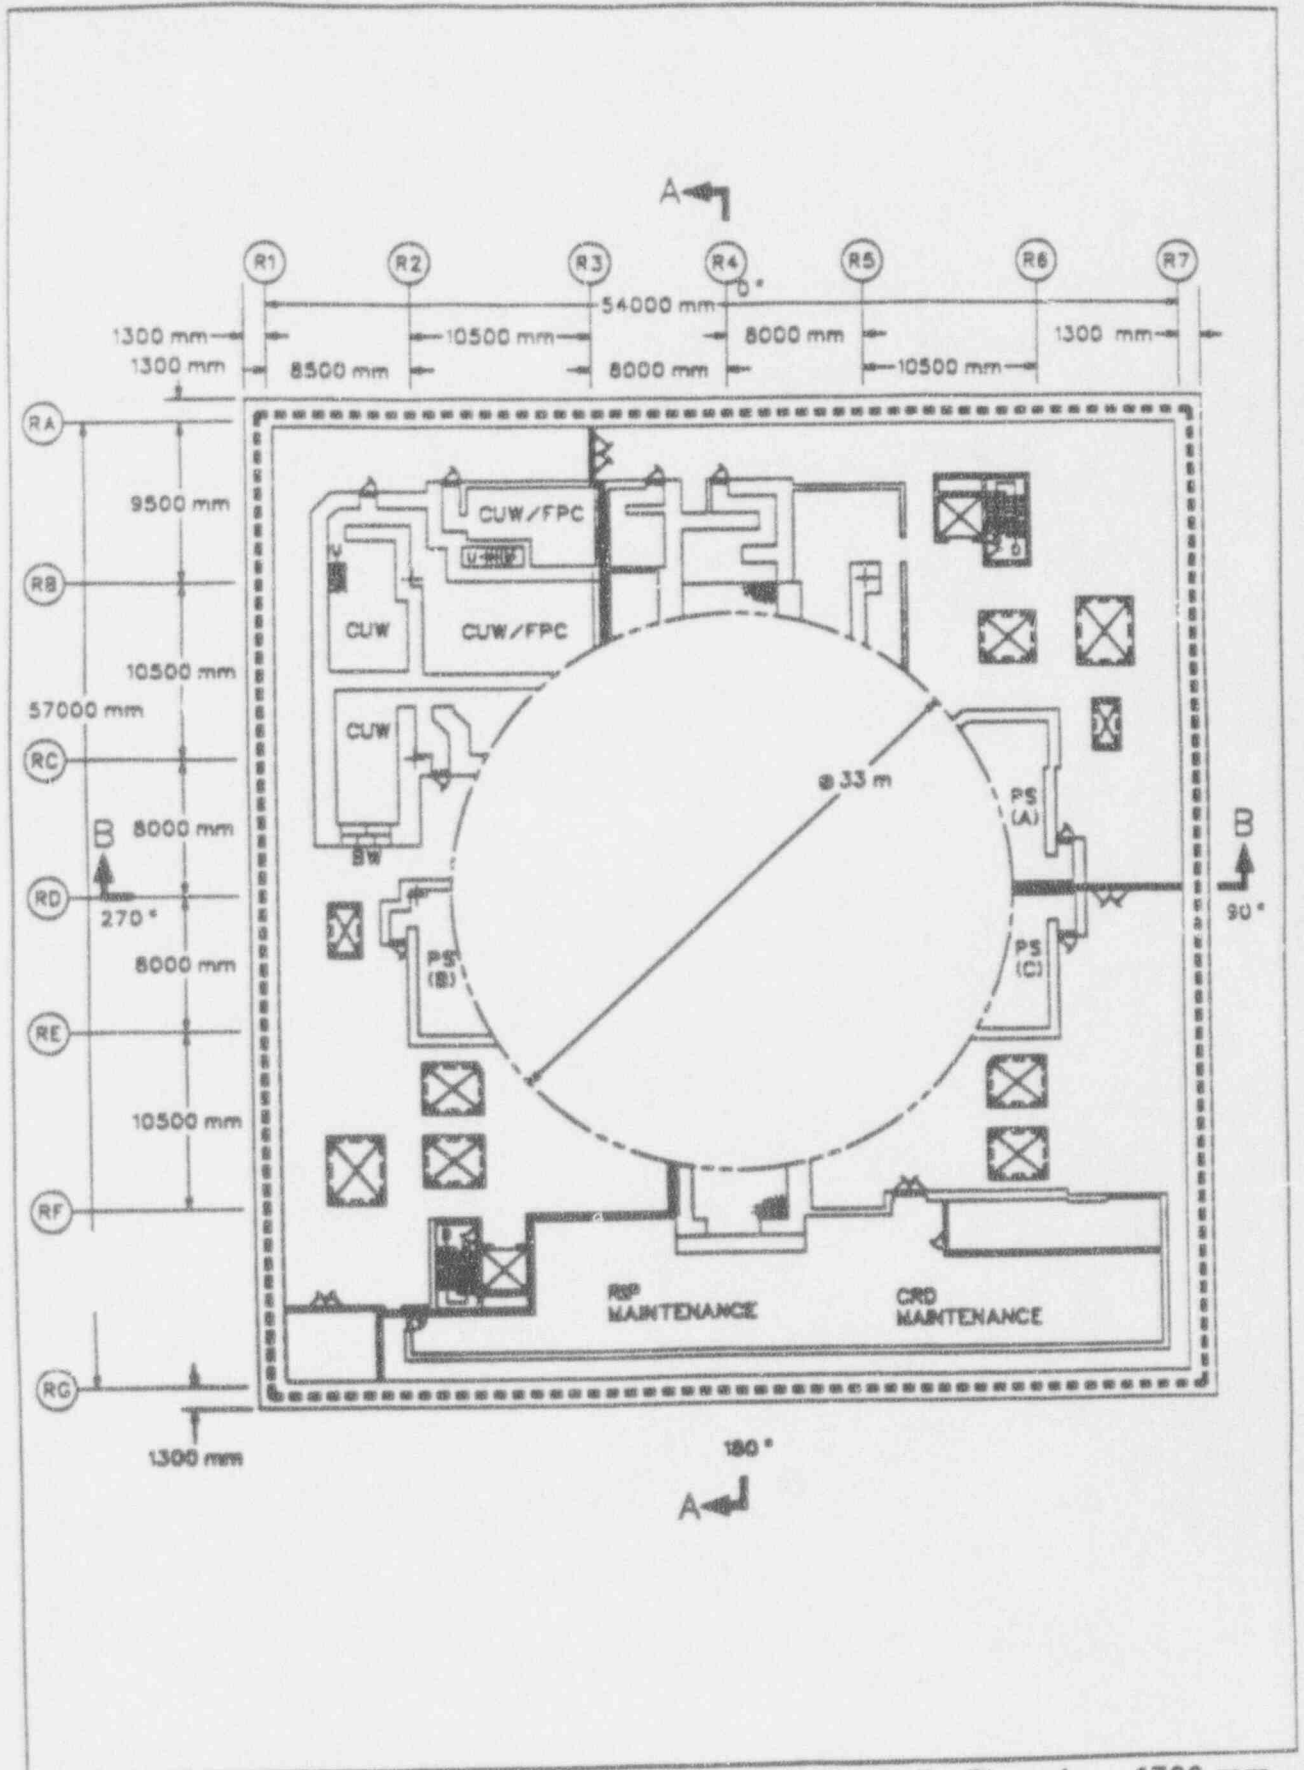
Reactor Building Arrangement, Floor B2F—Elevation -1700 mm
